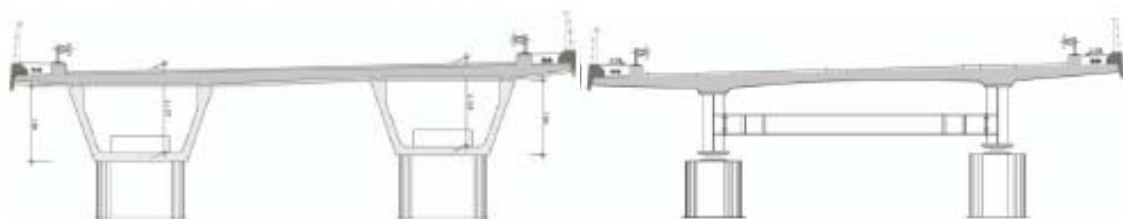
a) Pre-stressed concrete deck and b) steel-concrete composite deck (Gervasio et al., 2007)
